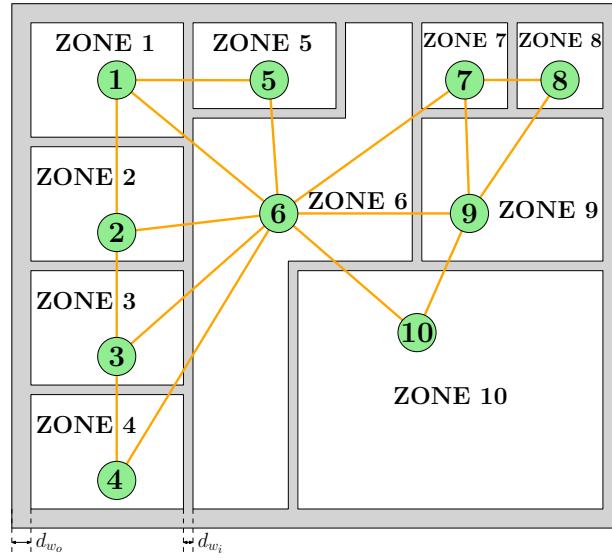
Floor plan of the trivial case example building with its adjacency graph. Walls are grey coloured. Outer dimensions of this building are approximately 35×29 meters. Room dimensions and inner (outer) wall widths d_{w_i} (d_{w_o}) were used to calculate true parameter values.
